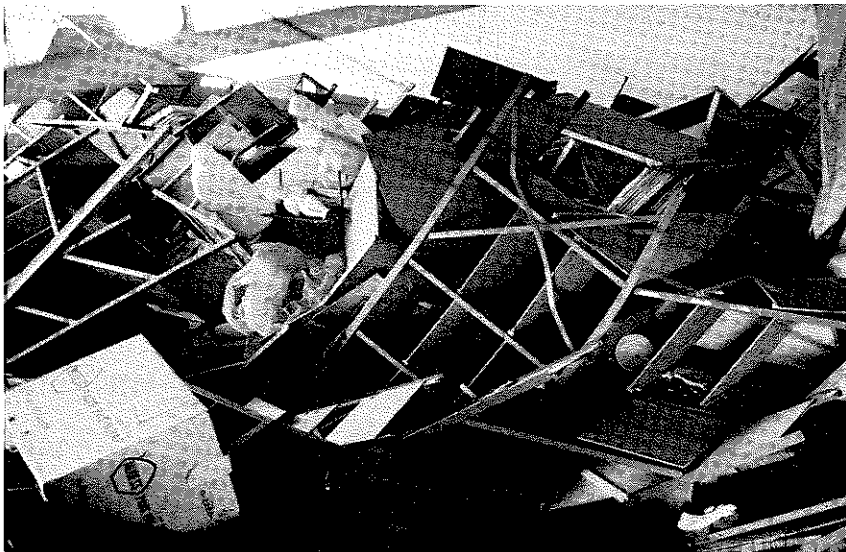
The storage shelves on the seventh floor of the Holy Cross Hospital were not properly secured. Potential hazards of this type can be avoided.
